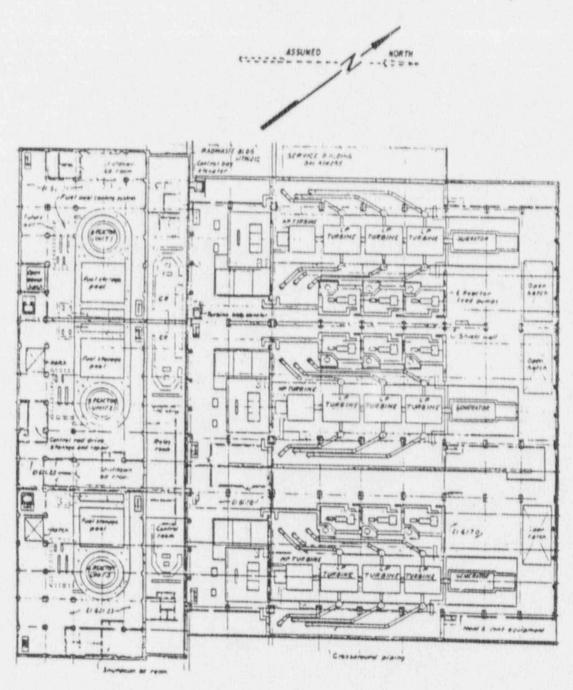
Overall Layout of the Browns Ferry Nuclear Plant, Elevations 586 ft. (Turbine Building) and 593 ft. (Reactor Building)
